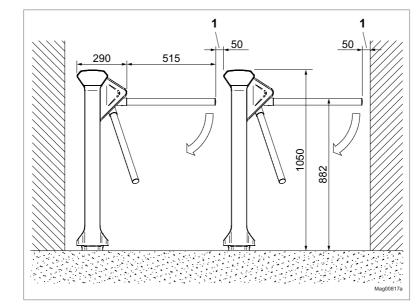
Dimensions FMTP-MS (dimensions in mm)
